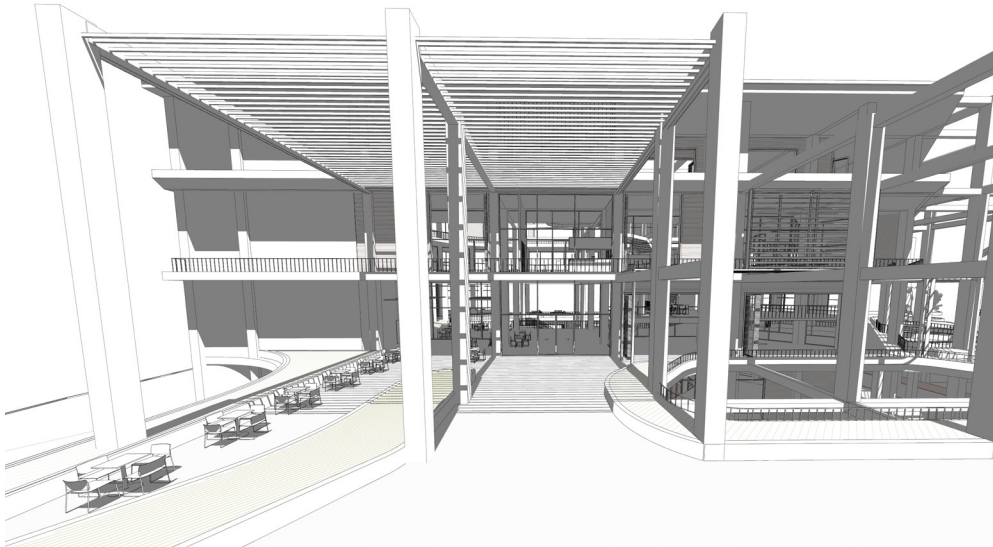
EAST ENTRANCE FIRST FLOOR (AUTHOR 2021)
